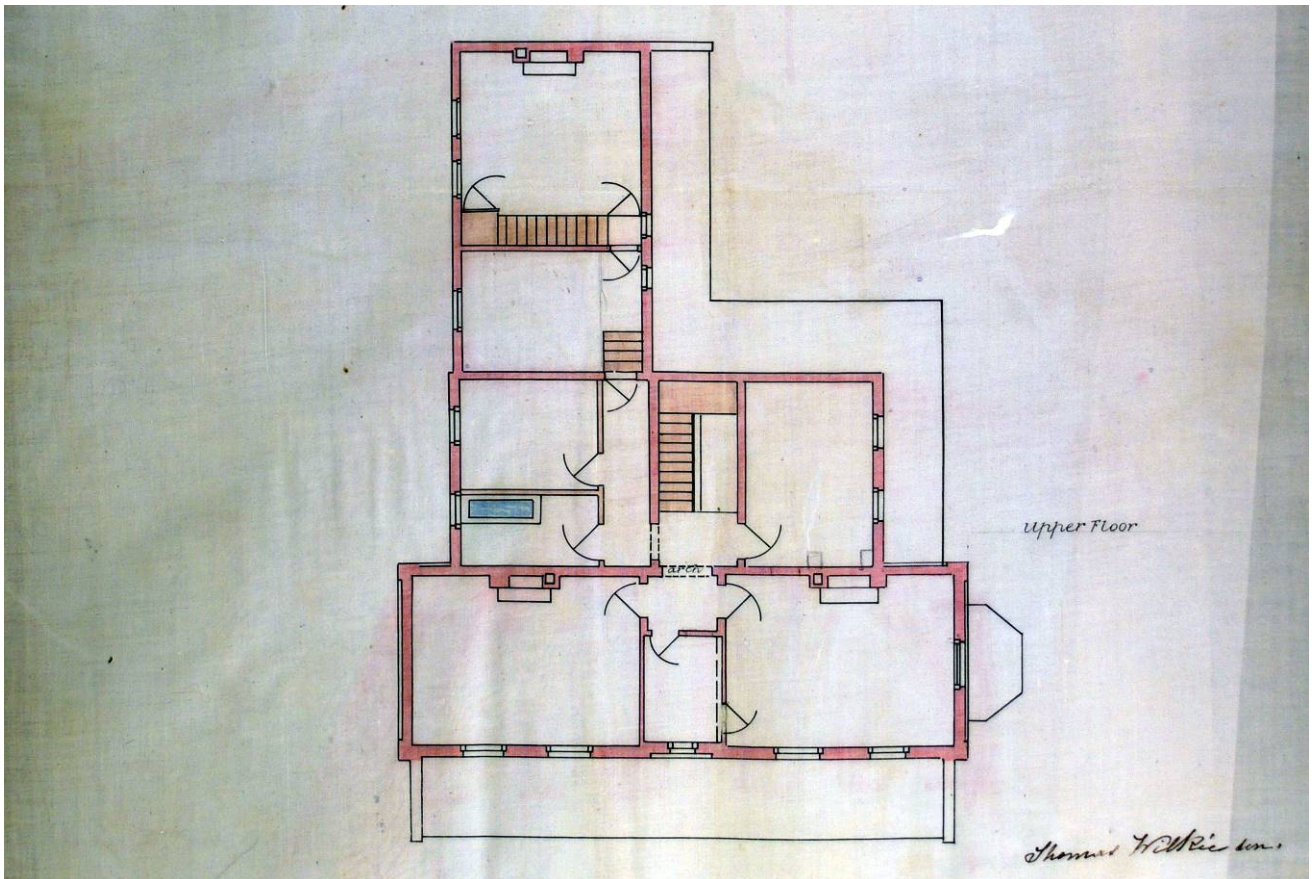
1887 design specification for Teneriffe, showing upper floorplan, note red walls appear to denote brick additions to the existing building (Source: Goulburn Historical Society)
